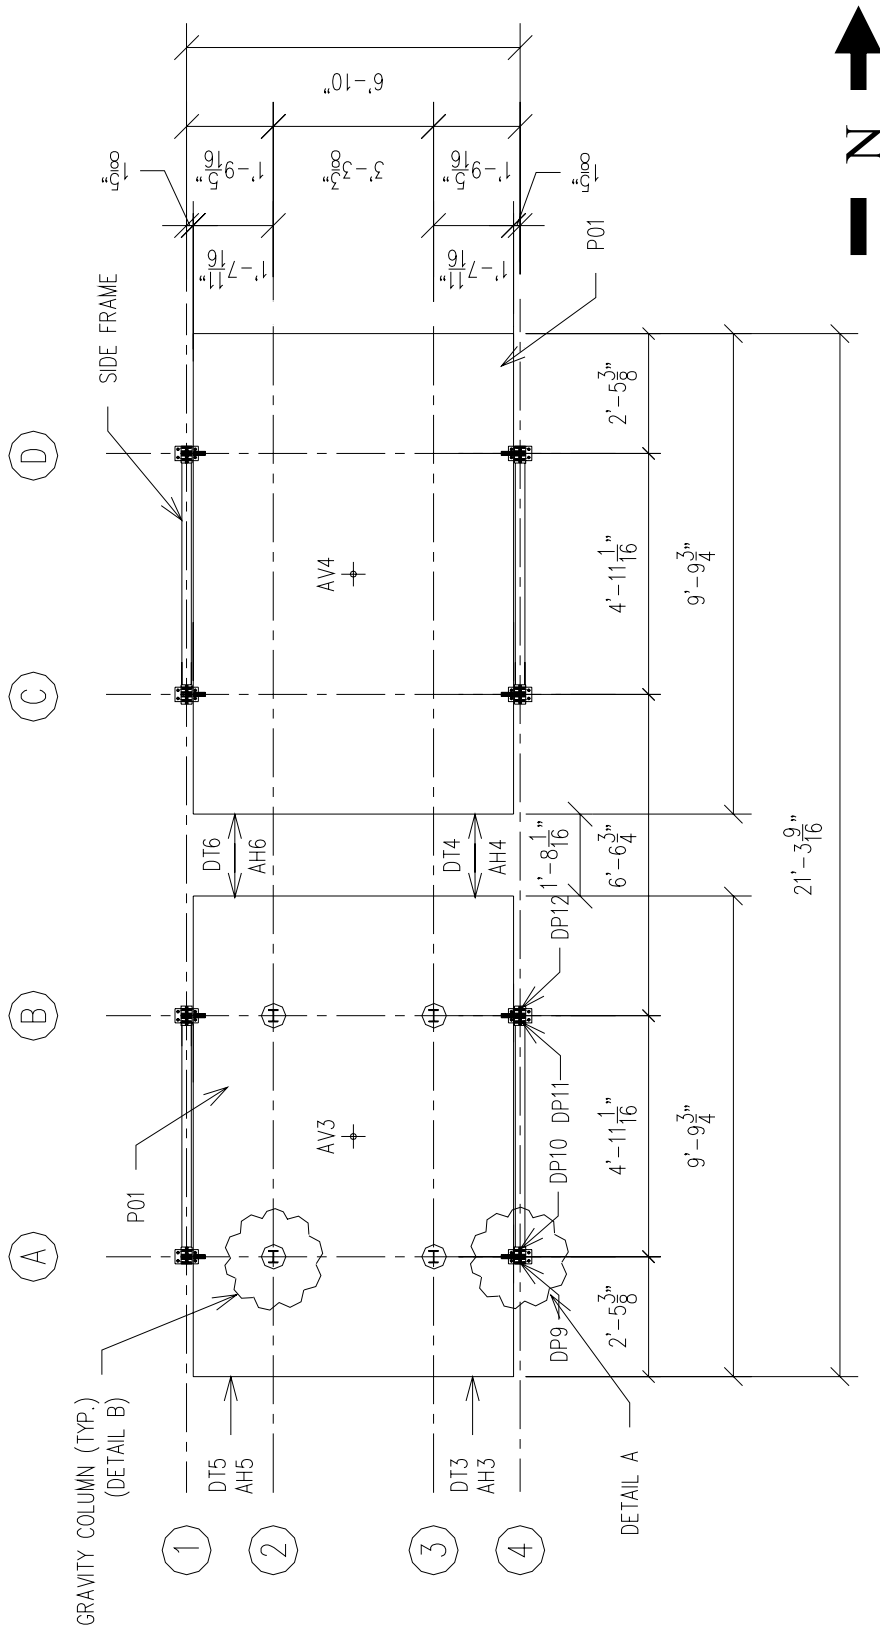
Instrument Locations for Identification Test: 2nd Floor
